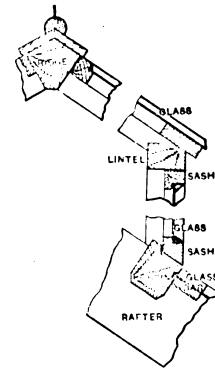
Details of Lantern.—Scale, 1 1/4 Inches to the Foot.
